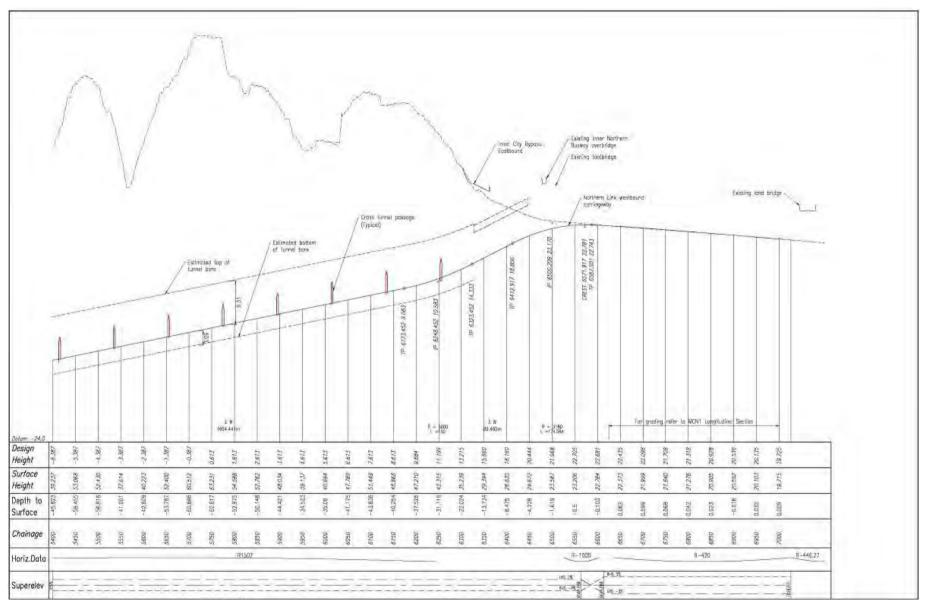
Westbound tunnel vertical alignment –ICB Connection
